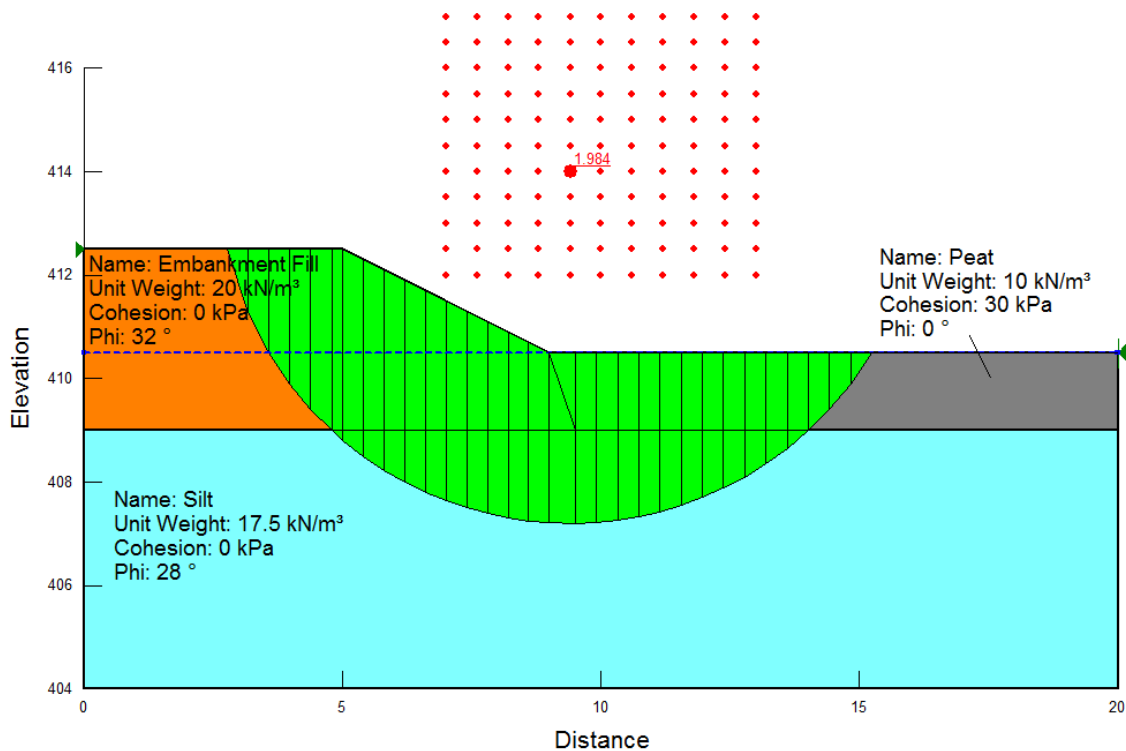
Slope Stability, Station 10+977, Twp of Cooper
